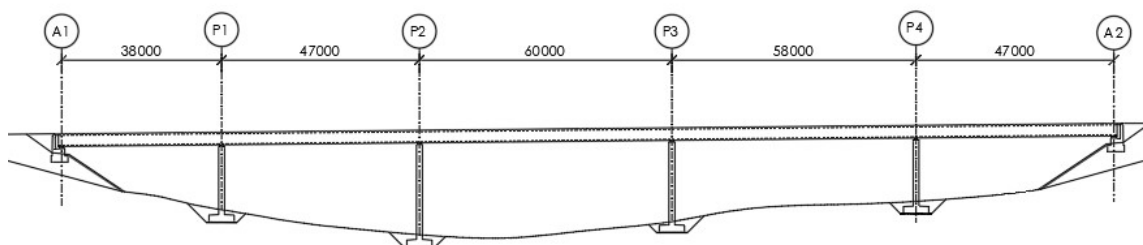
Box girder built on a movable scaffolding system – longitudinal section
